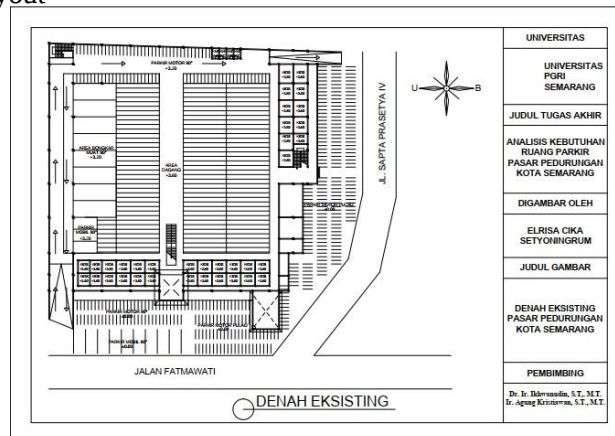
Eksisting Site Plan of the Parking Area at Pedurungan Market
